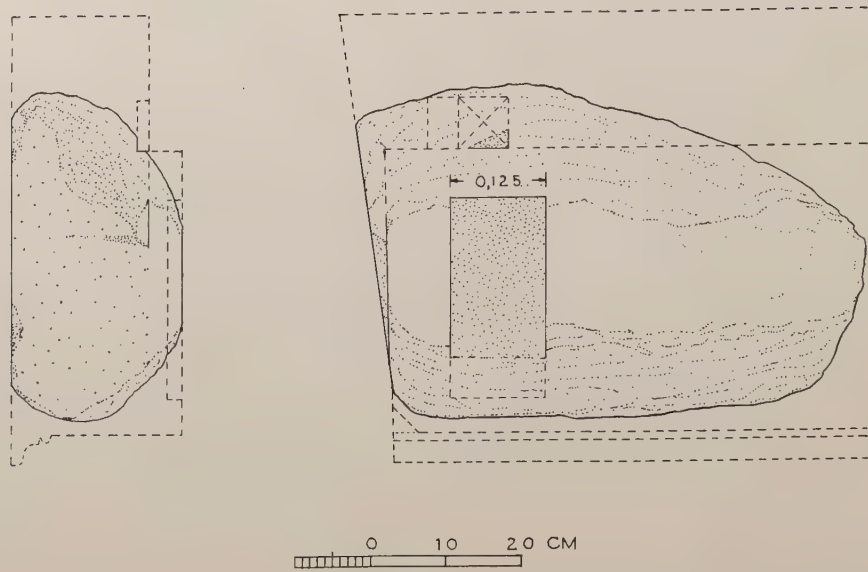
Left End of a Sill: Fragment No. 2. Plan and End Elevation
